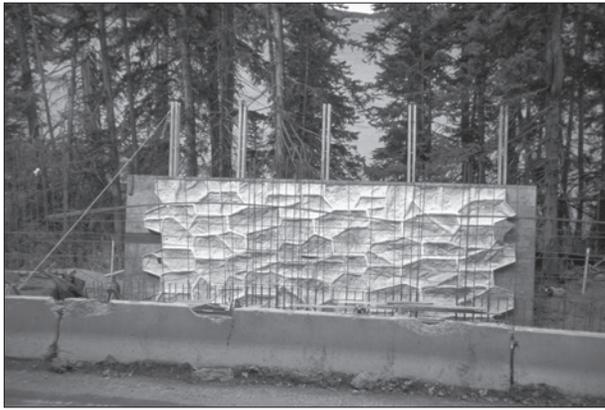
Formwork and foundation for simulated stone retaining wall, Yellowstone National Park. (Davis 1996)
